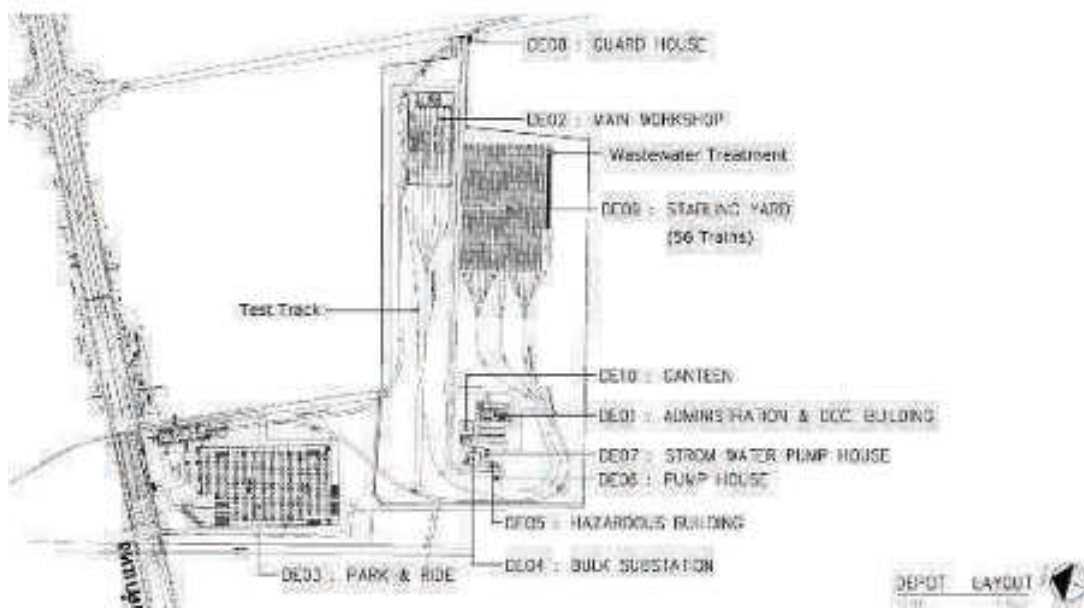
Layout of Depot and Park & Ride Building at Rom Klao Intersection
